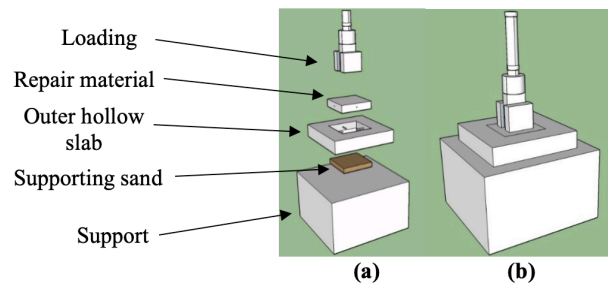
Punch test setup for (a) an exploded view and (b) a normal view.
